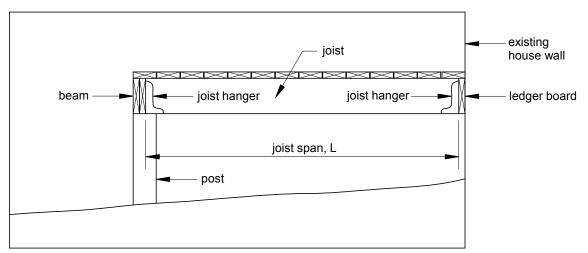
JOIST SPAN - DECK ATTACHED TO SIDE OF BEAM
